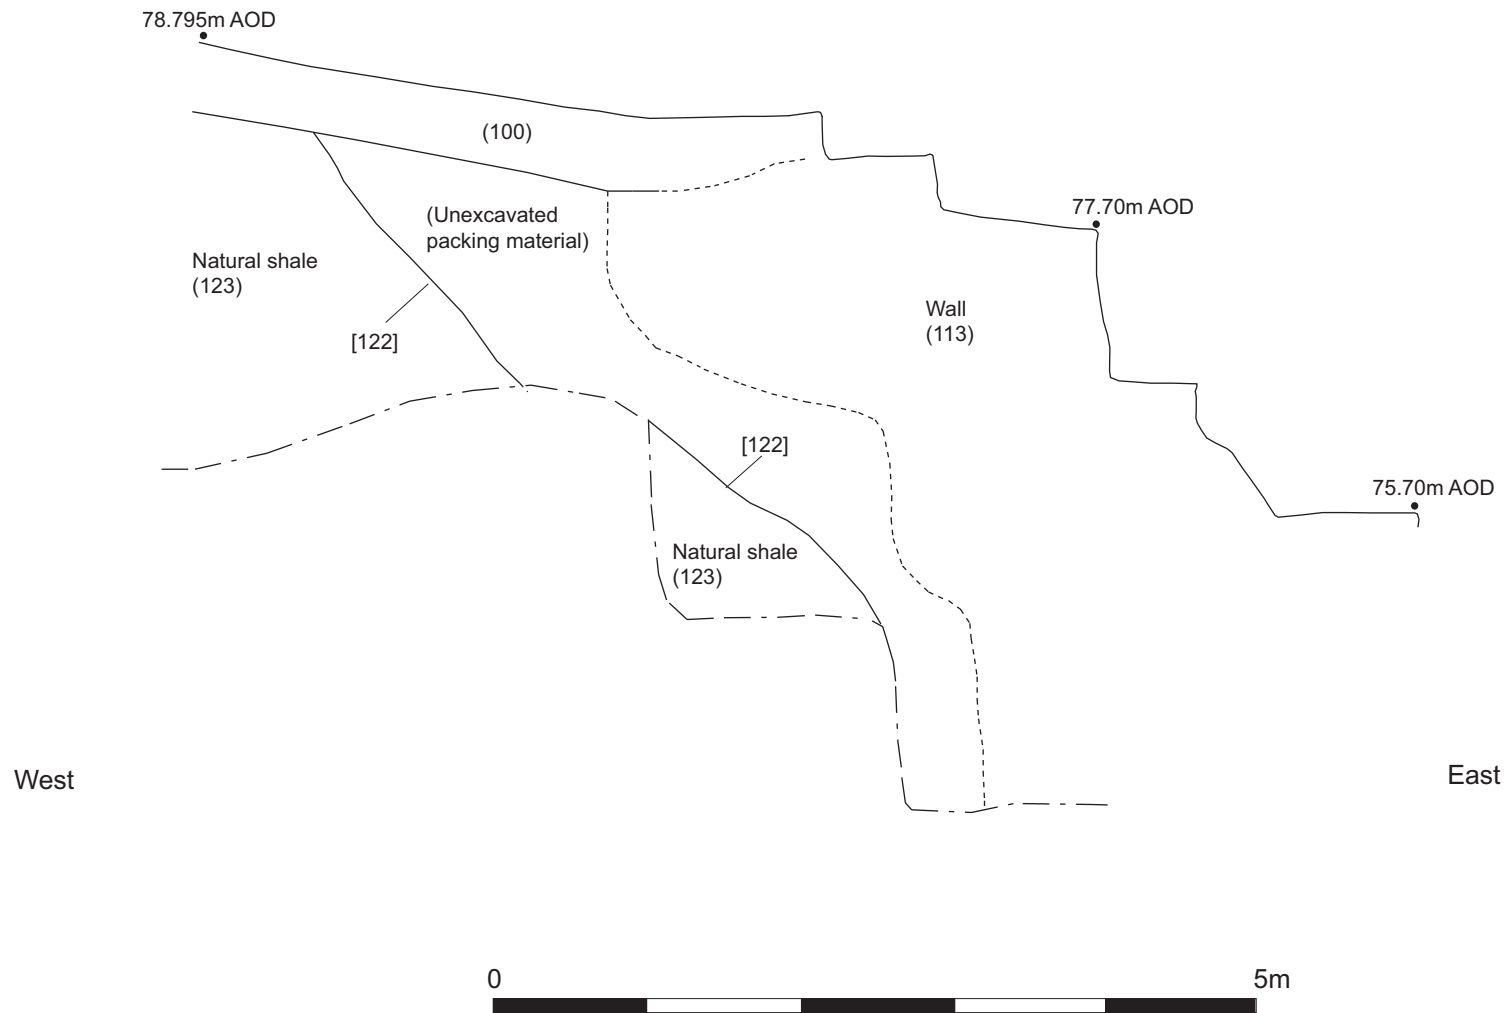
South facing section/ elevation, showing construction cut 122, Alum Scar Bridge
